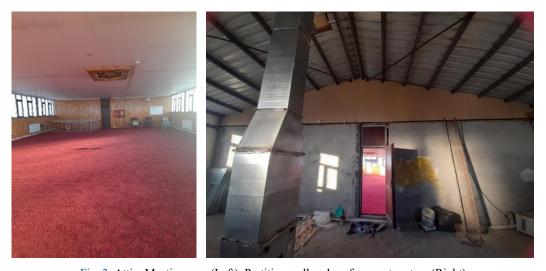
Attic: Meeting area (Left), Partition wall and roof support system (Right)
